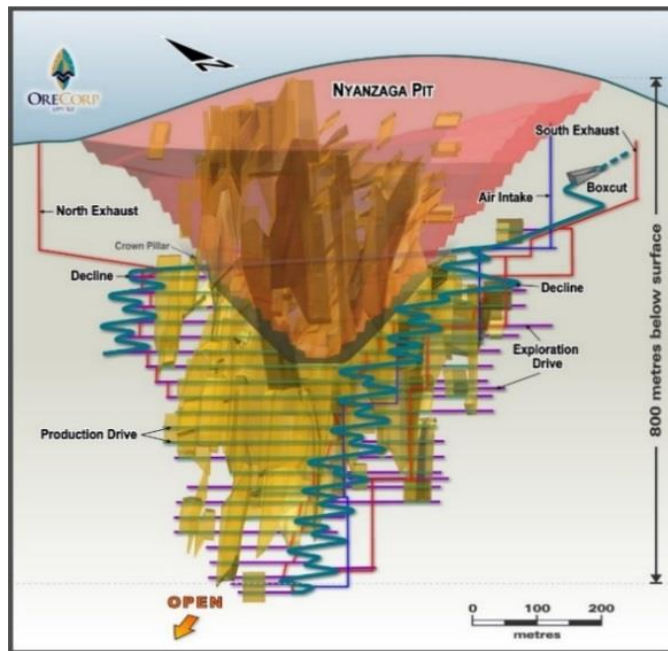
Nyanzaga Proposed Open Pit and Underground Mining Infrastructure (Looking Northeast)
